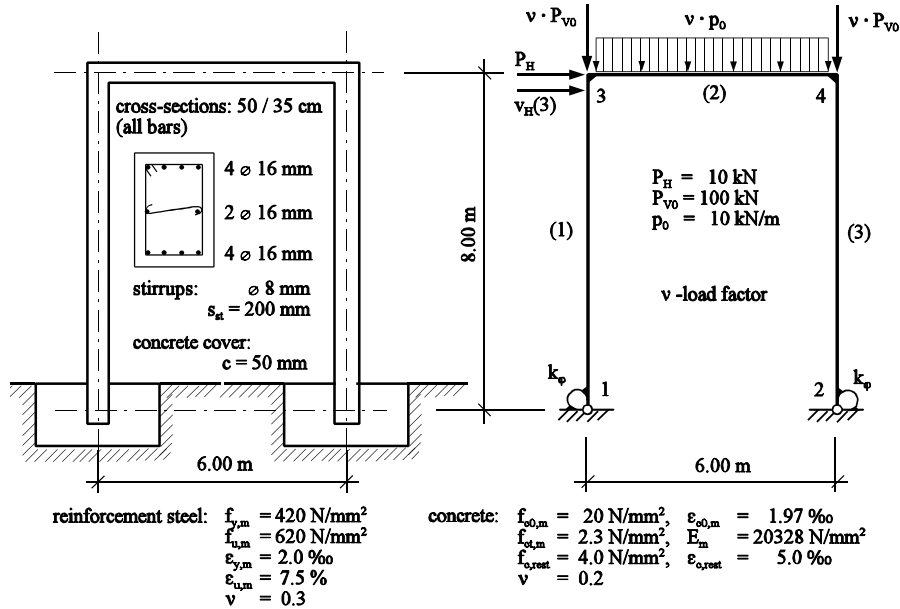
Reinforced concrete frame (plane); structure, cross-sections, materials, static system with loading
